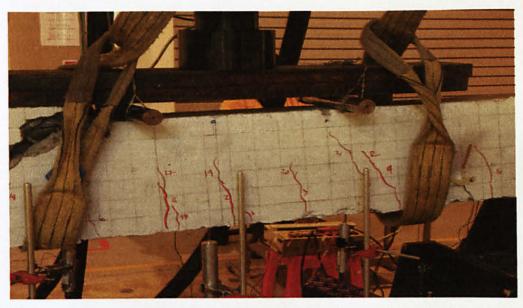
Crack pattern of control beam subjected to static load indicating failure in bending at center of beam.
